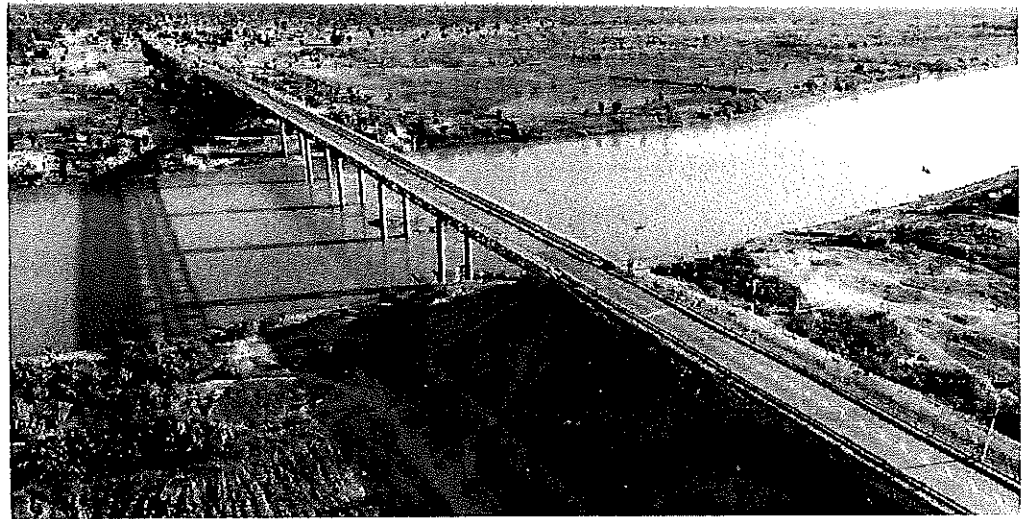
Aerial view of Buipe Bridge over Black Volta, towards south.
